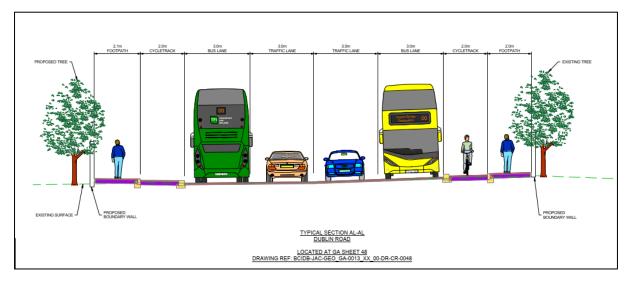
Extract from Typical Cross-section at Dublin Road, Shankill (Sheet 22)
